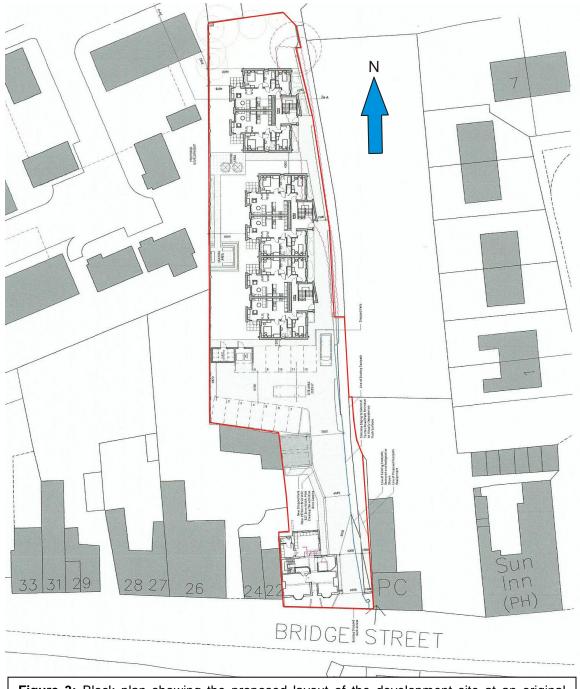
Block plan showing the proposed layout of the development site at an original scale of 1:200 at A1, (extract from Architects plan)
